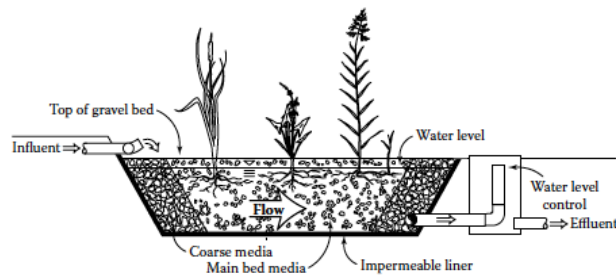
HSSF Constructed Wetland (Wastewater Gardens<sup>®</sup> Information Sheet 2016)
